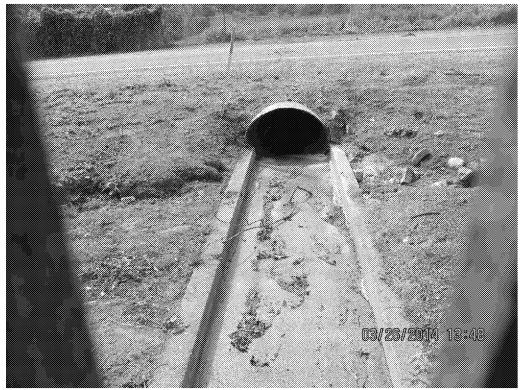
View through the fence of the cement channel, as it enters a culvert that crosses under North Lake Wohlford Rd.
